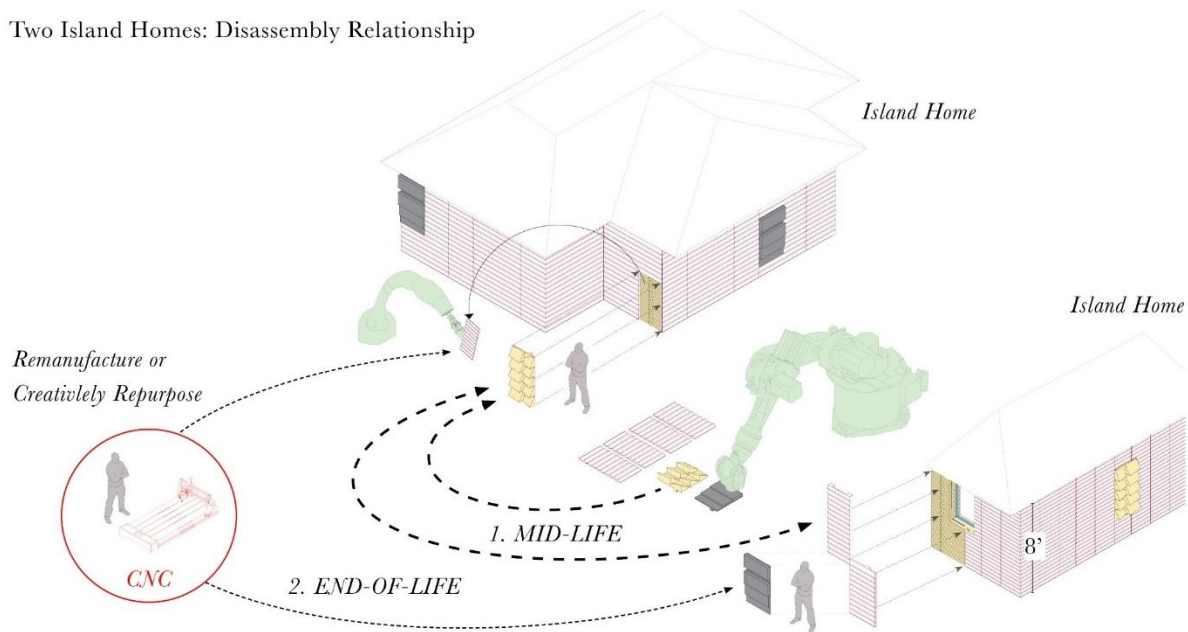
Two Island Homes: (1) Selective disassembly and reassembly of modules at mid-life stage due to homeowner's desires (2) Selective disassembly and reassembly of modules at end-of-life stage due to need for replacement or damage. At this stage, the modules and components could be creatively repurposed into other products of higher entropy.
